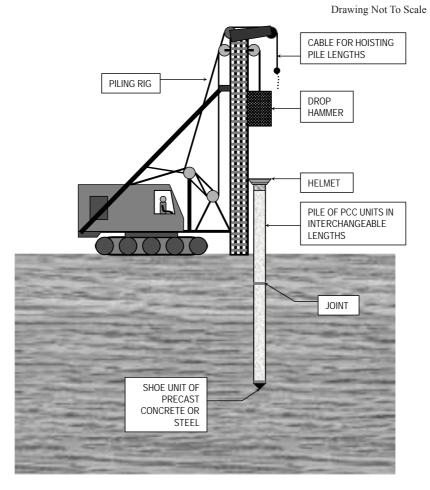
(a). Precast reinforced concrete piles driven by a drop hammer.
